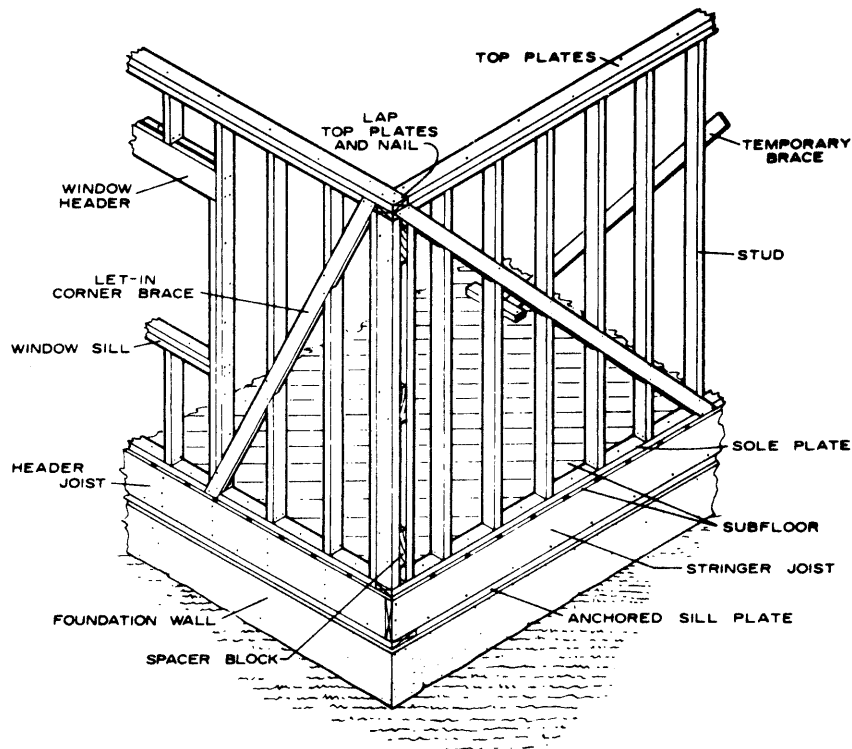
Exterior wall framing, platform construction. (U.S. Department of Agriculture)
